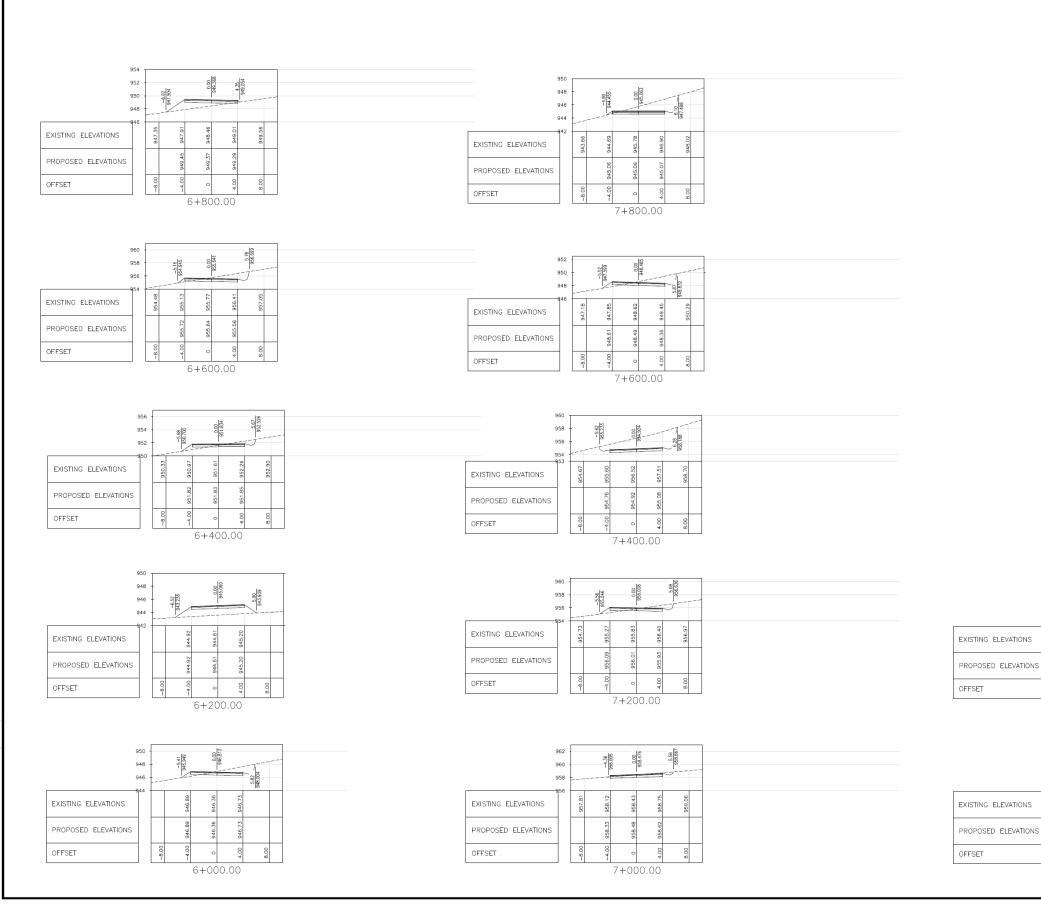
Smithfield Dam – Cross sections of access road to Nonguqa
